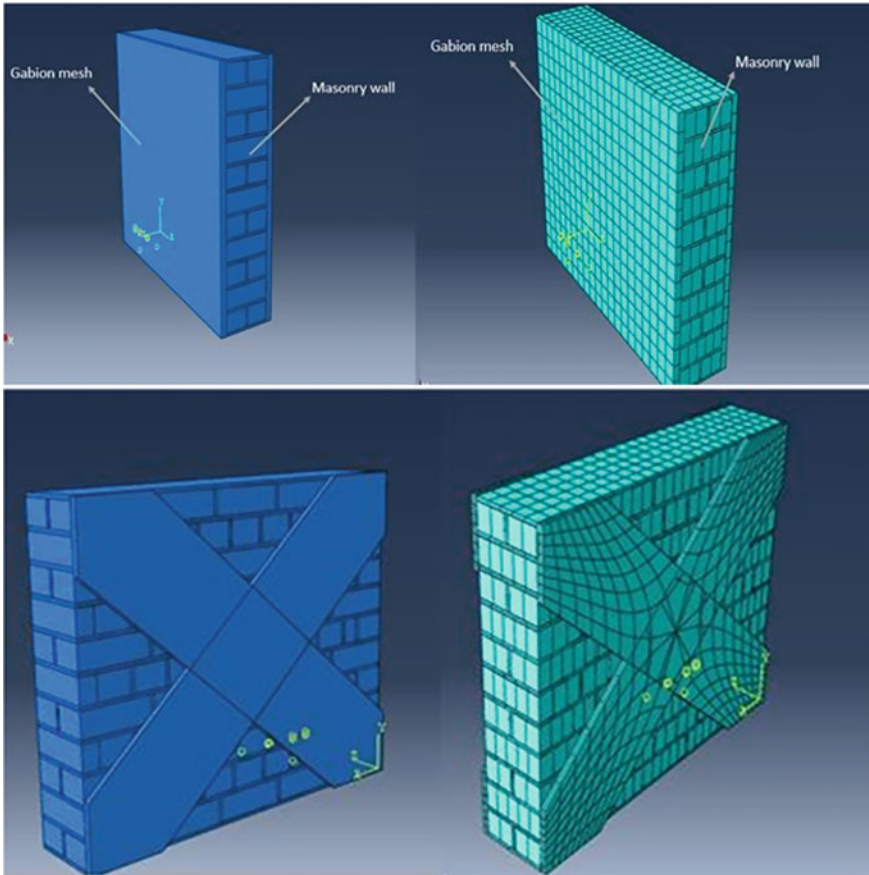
Modeling of the masonry wall with rectangular and diagonal retrofitting
